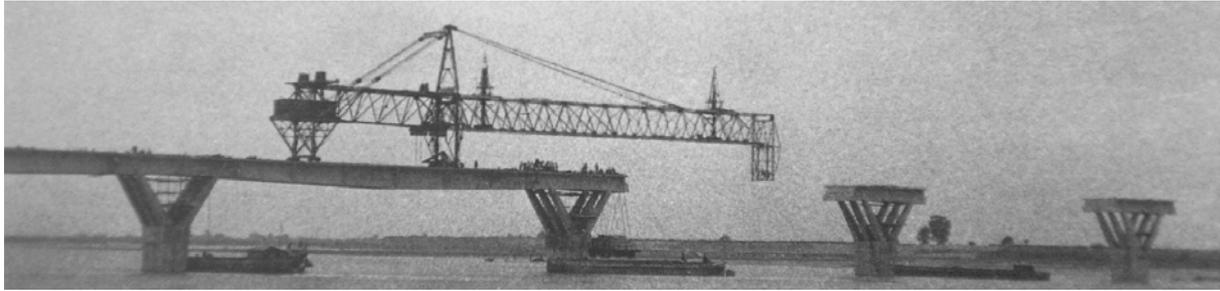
Kosi Bridge near Kursela, India, 1000 m long bridge built with 50 m long pre-cast girders and piers with “platforms” 15 m long to extend distance between piers. (Wittfoht)
